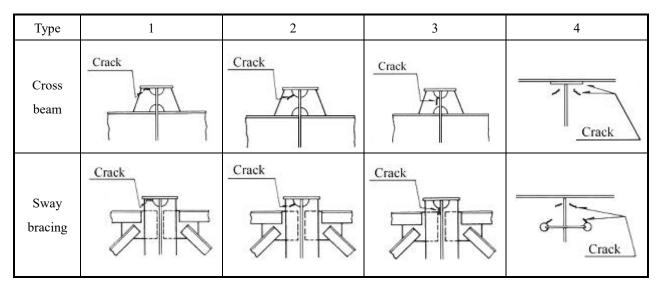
Cracks pattern of simple composite I-girder
